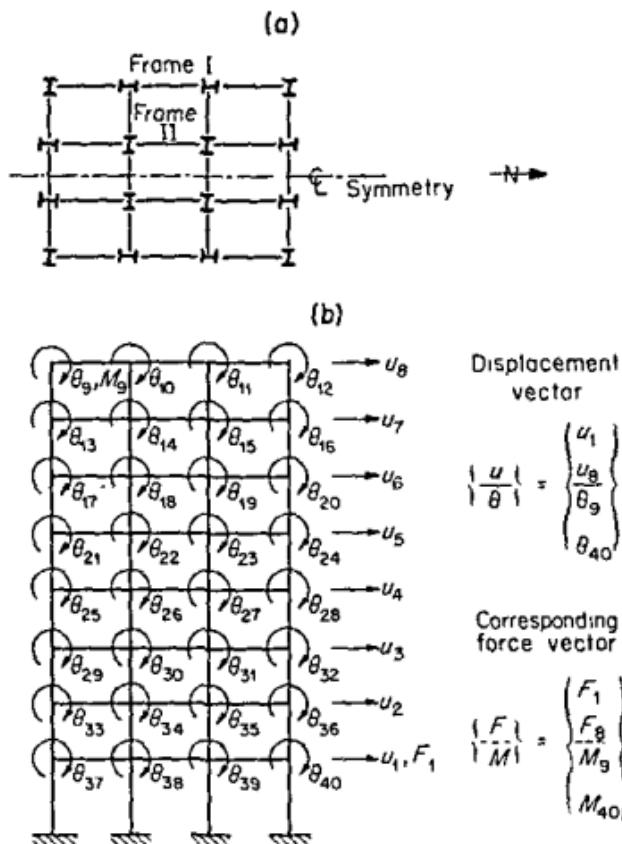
A symmetrical tall building. (a) Typical floor plan showing only rigid frames. (b) Schematic elevation of frame I or II showing force and displacement coordinates.
